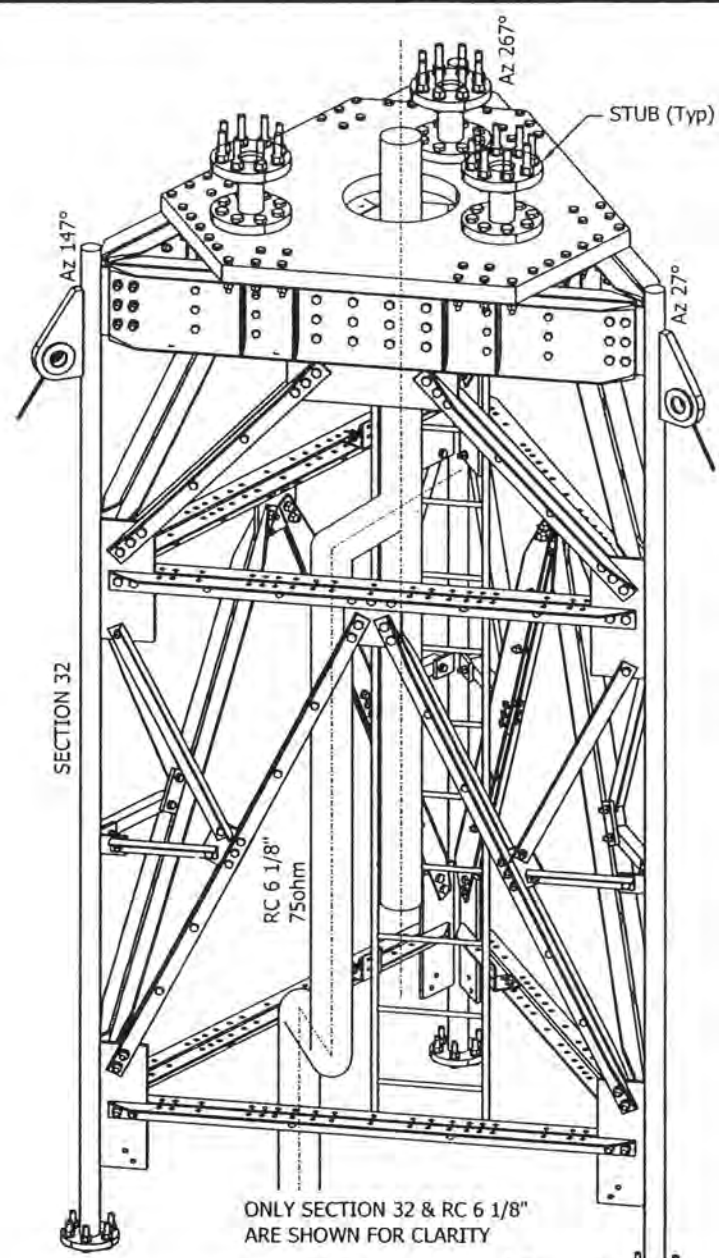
" - TYPICAL TOP CONNECTION DETAILS
